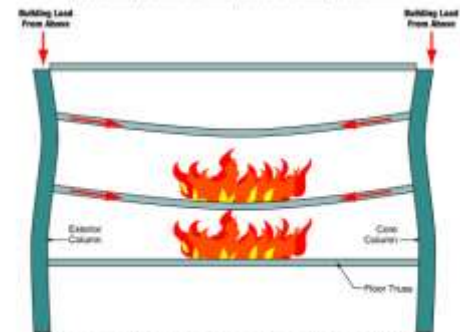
Secondary action of floor trussing on several floors induces column buckling failures.
